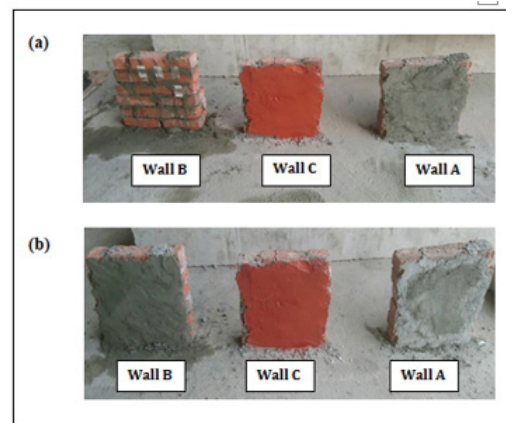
(a) Wall panel Type B before plastering, (b) Plastering completed for all wall panel type
